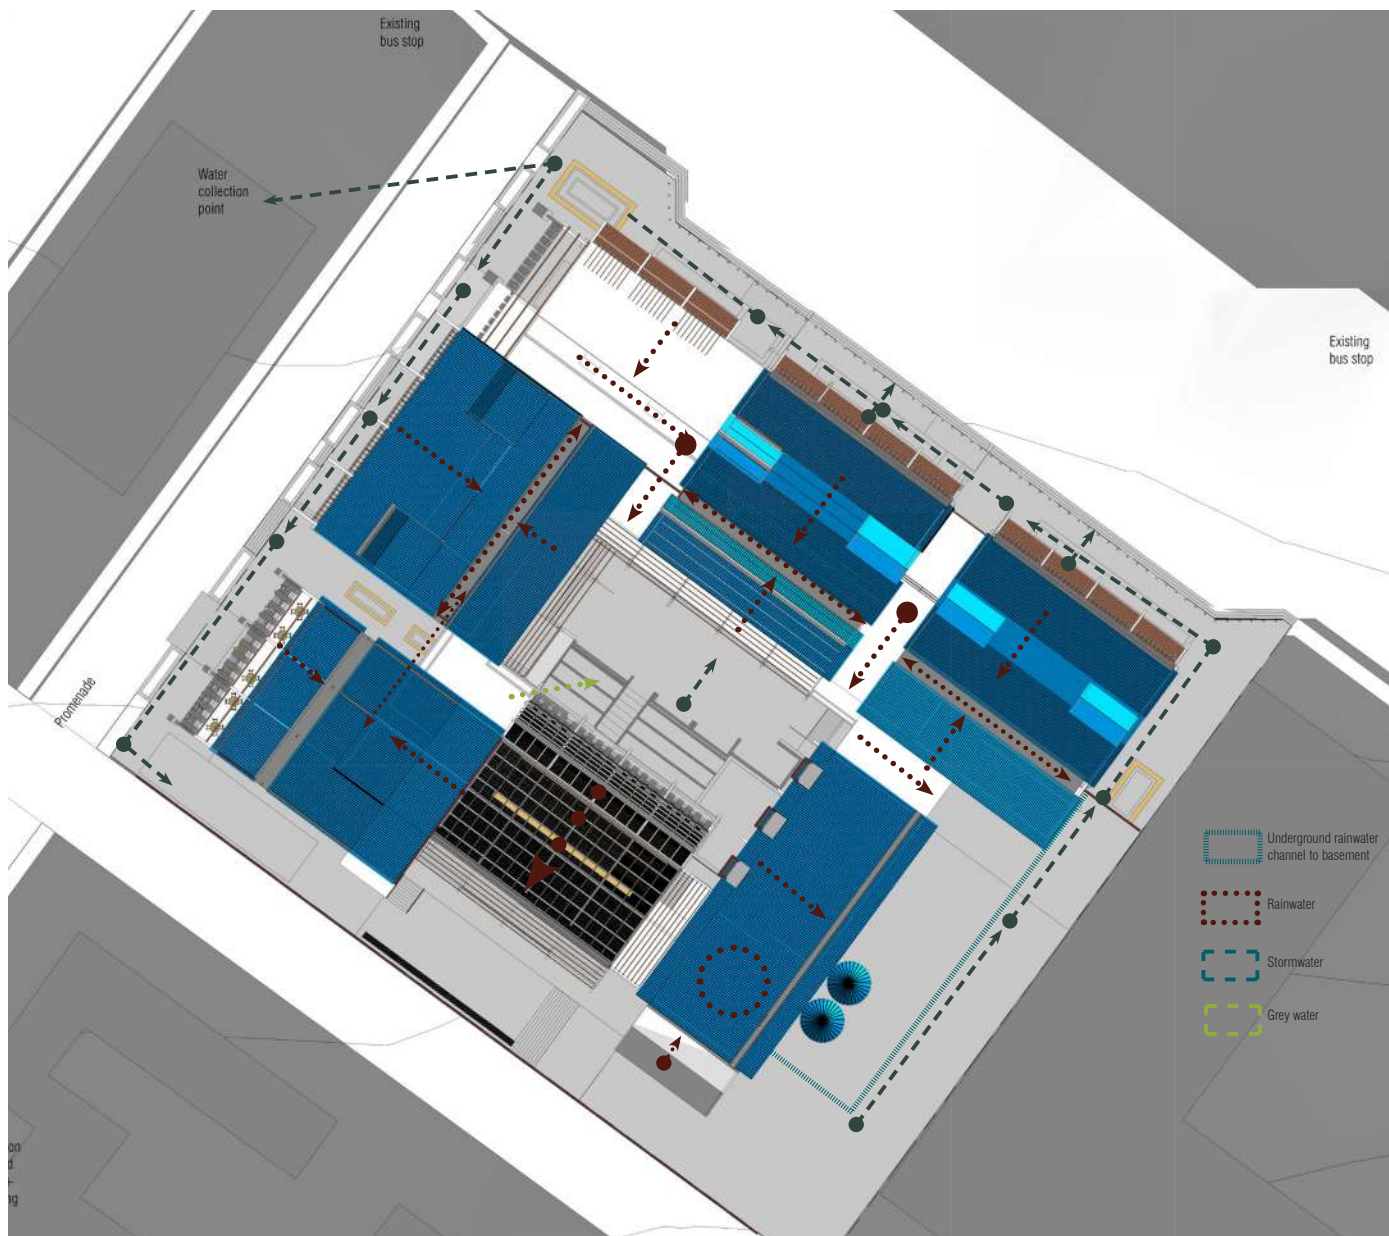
Site plan showcasing rainwater harvesting (Author,2020)
